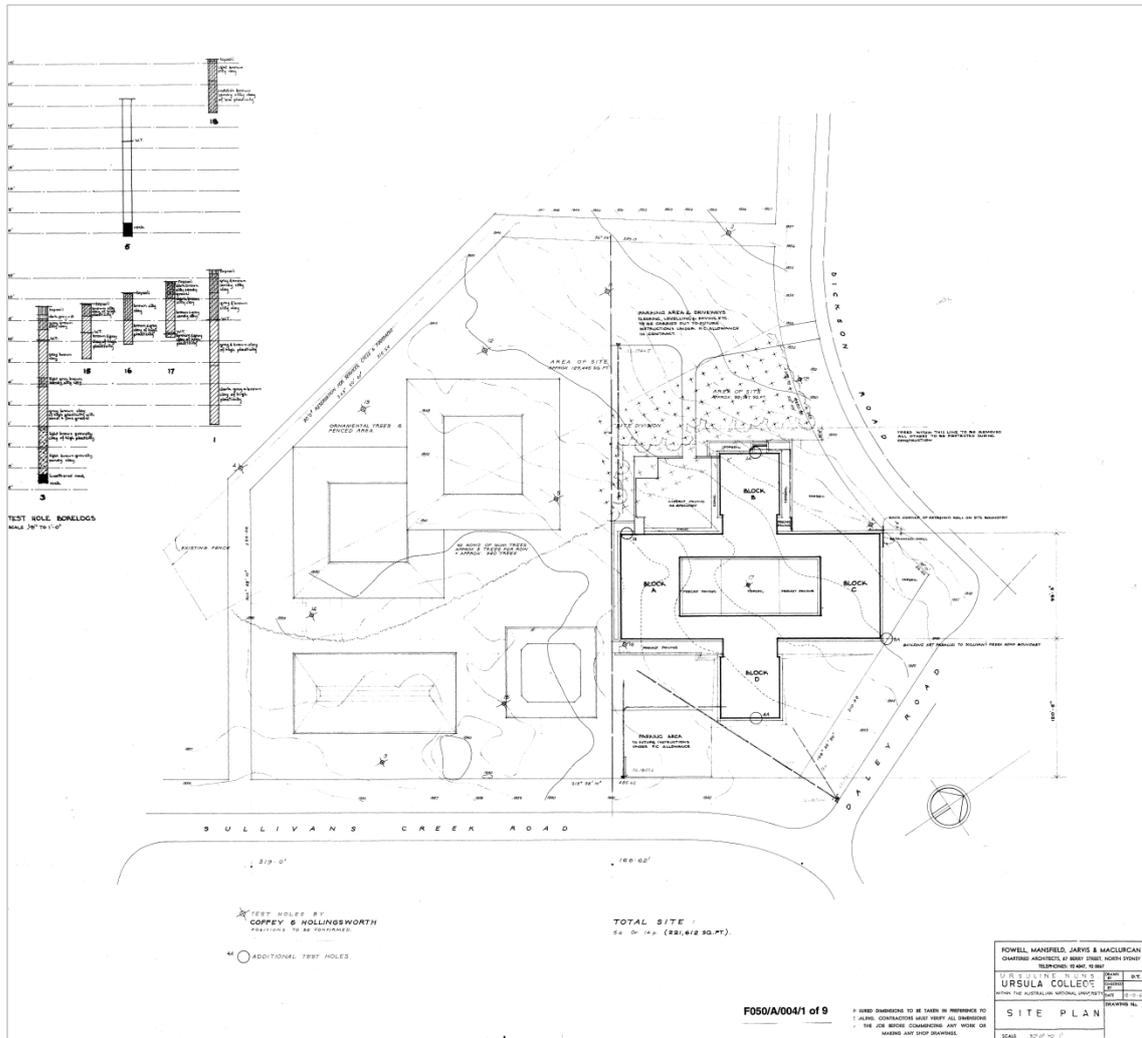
The site plan including relation of Ursula Hall to John XXIII College and St John the Evangelist Chapel. Plan drawn in 1968 by Fowell, Mansfield, Jarvis and Maclurcan Chartered Architects.
